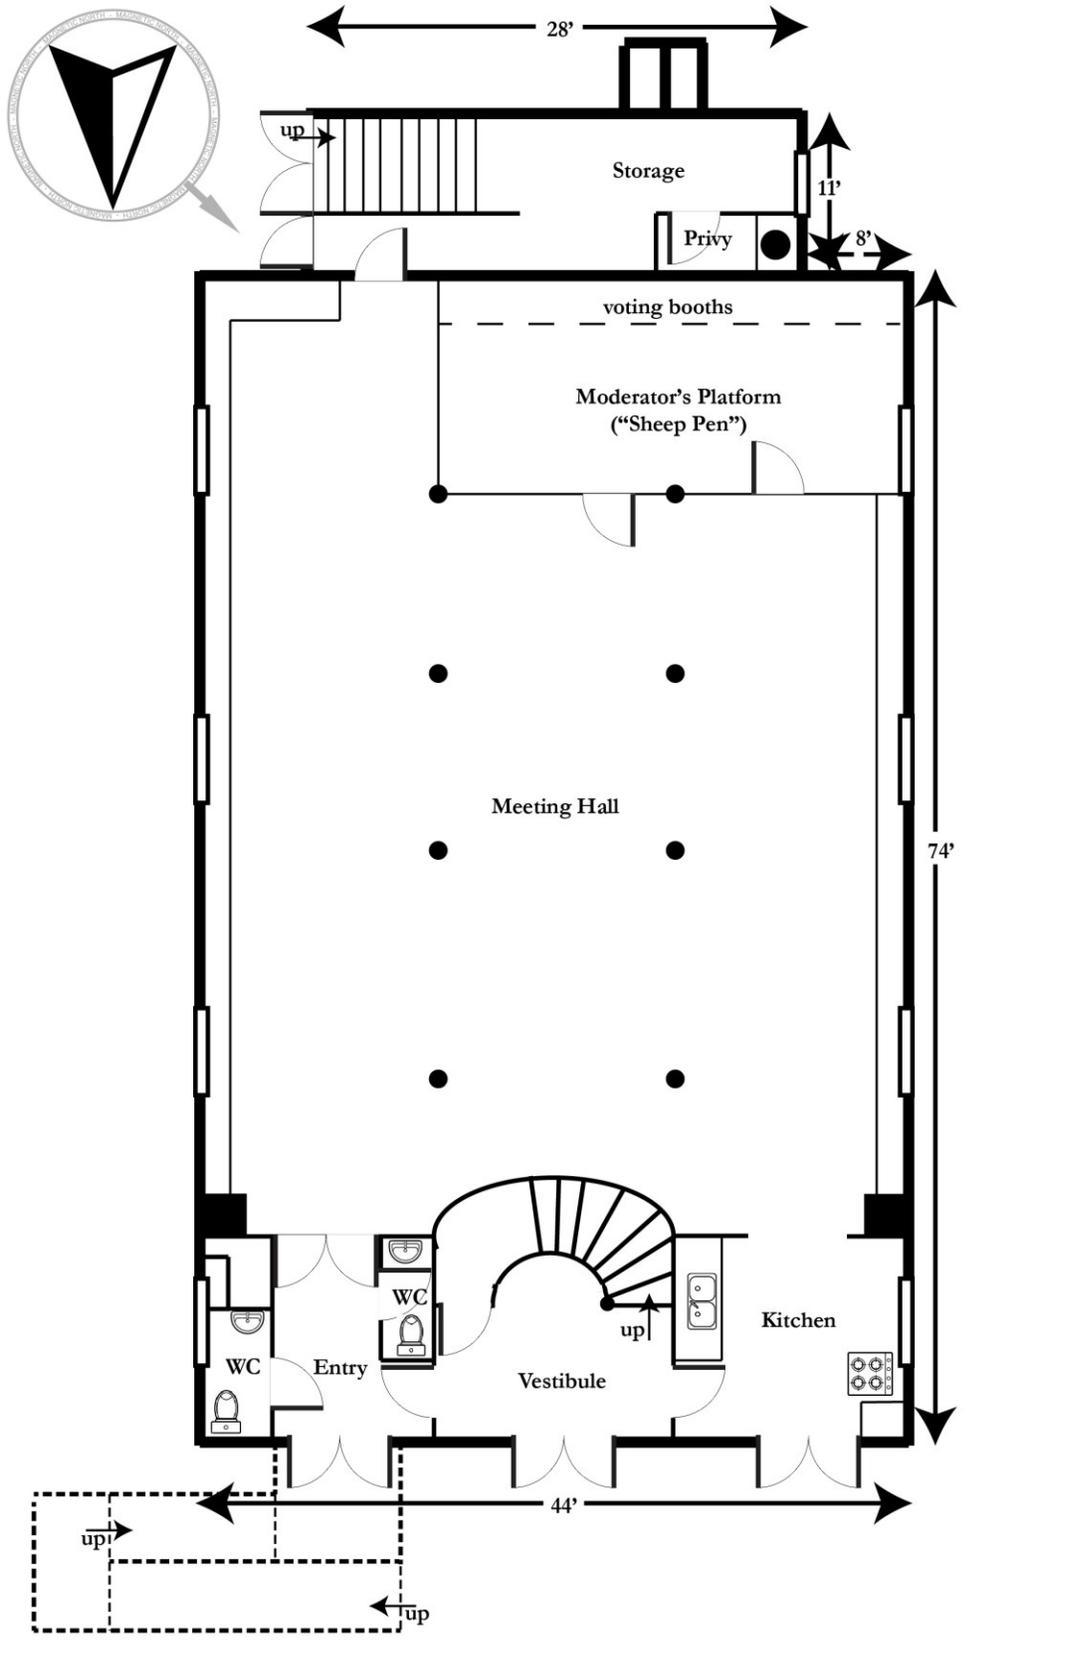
Approximate ground floor plan (not to scale). *Note project north is oriented down
